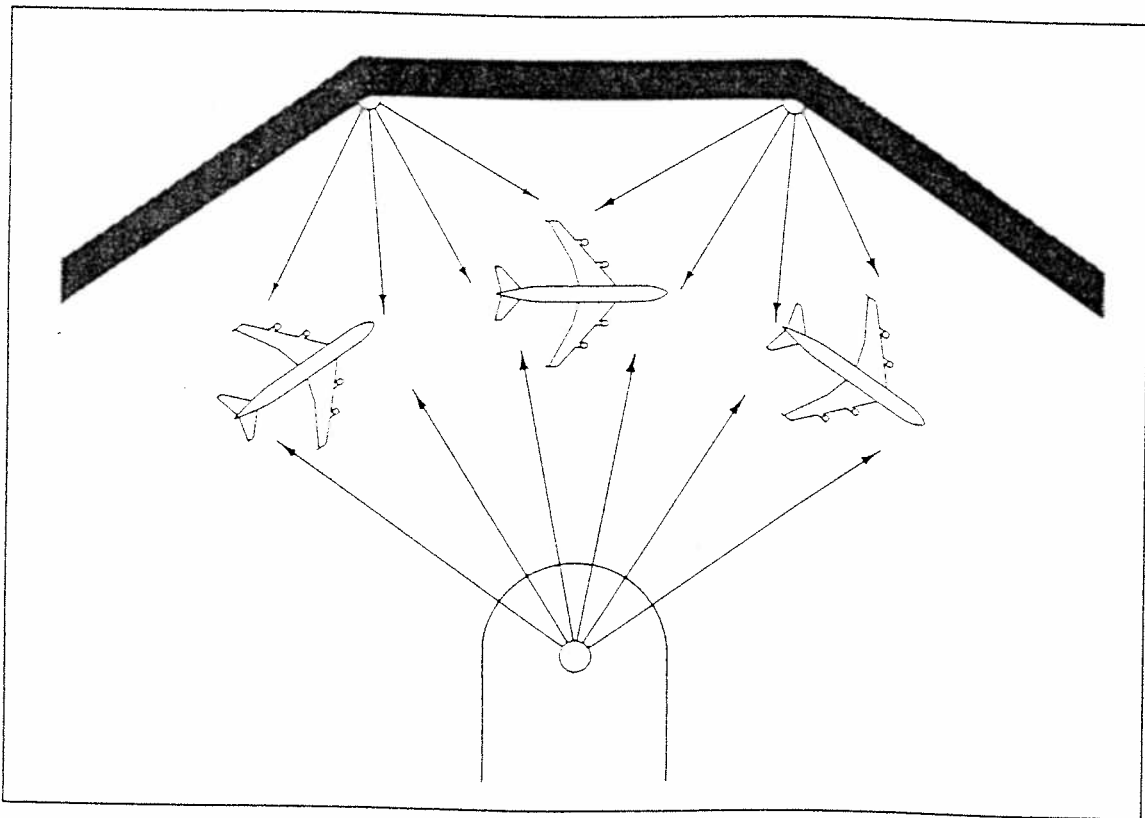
Typical floodlight arrangement and aiming for parallel parking
